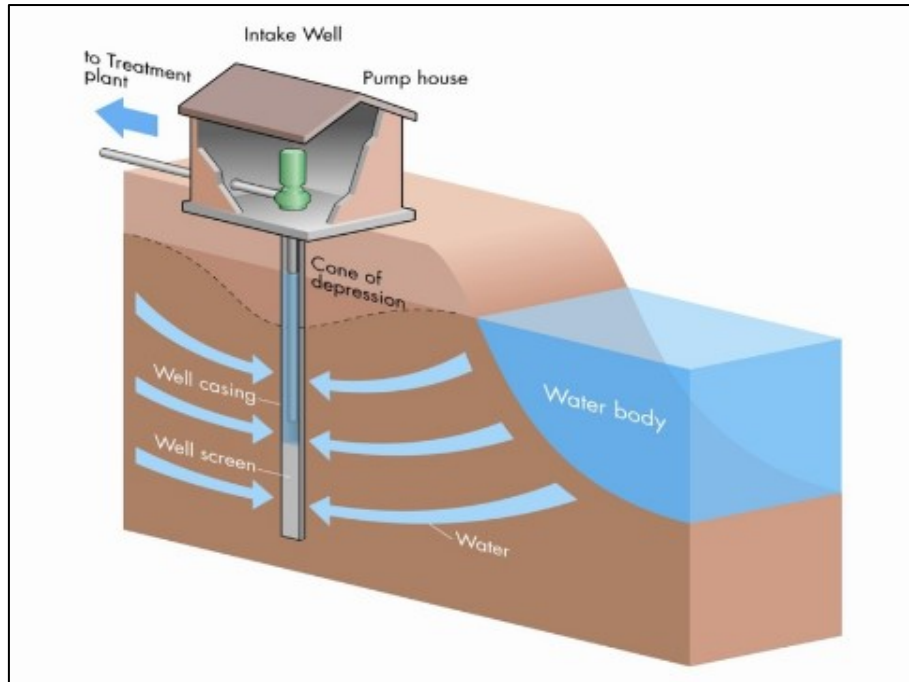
Schematic layout of a vertical beach well (Voutchkov, 2011).
